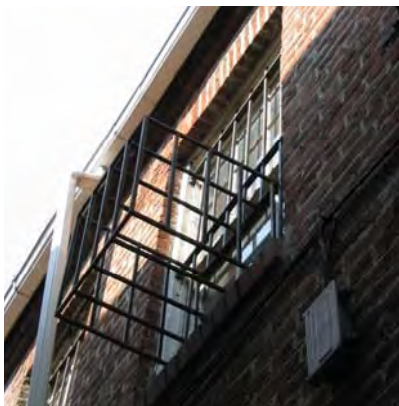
Window W207 showing iron grille and replacement brick sill. (Photo: BBB, 2007)
